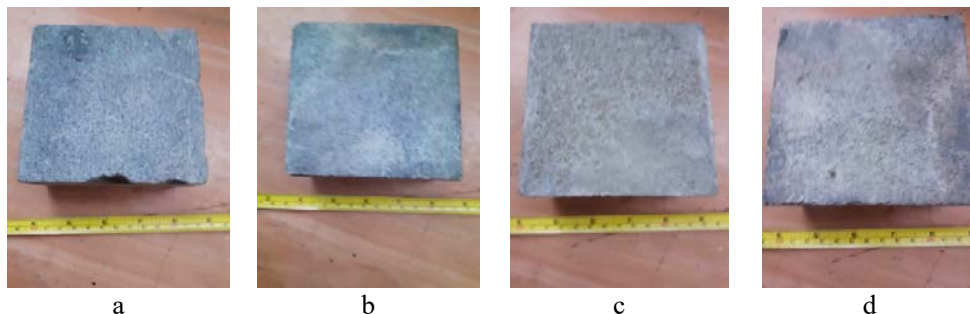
Appearance images of geopolymer concrete specimens reinforced with animal fibers
